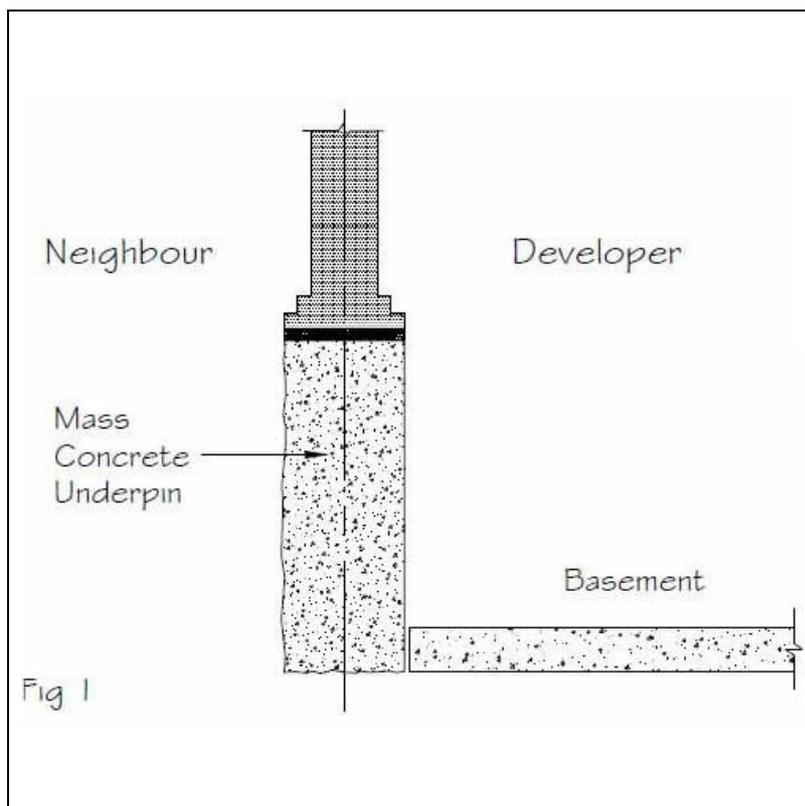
1980's: A typical mass concrete underpinning scheme. A separate basement raft slab and wall or tanking/ dry lining/ drained cavity were provided.
